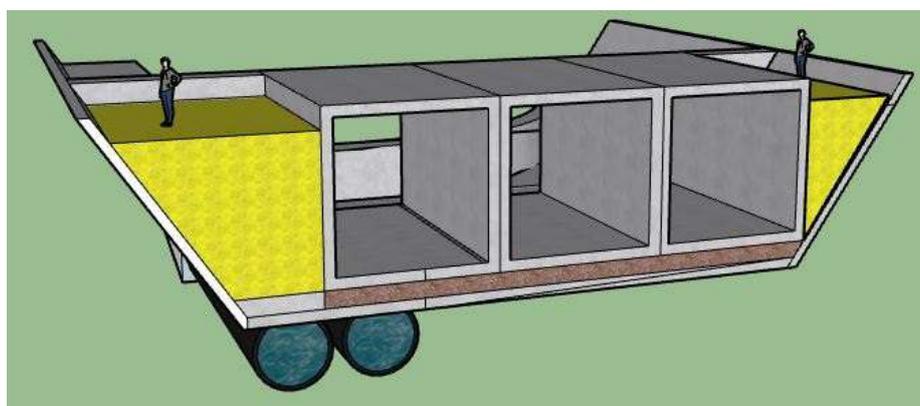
Culvert inlet for 60 m³/s design capacity at river mouth
